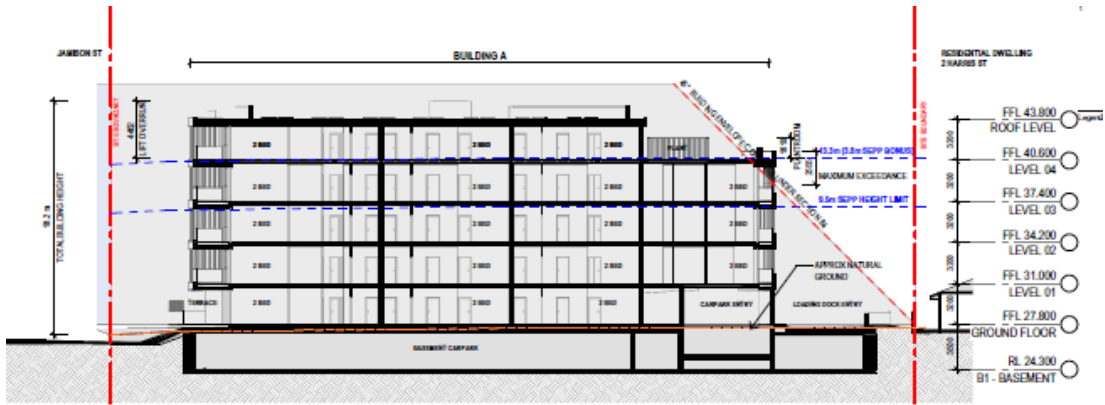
Proposed Building A Section 84 Building Envelope Compliance (Jackson Teece)
